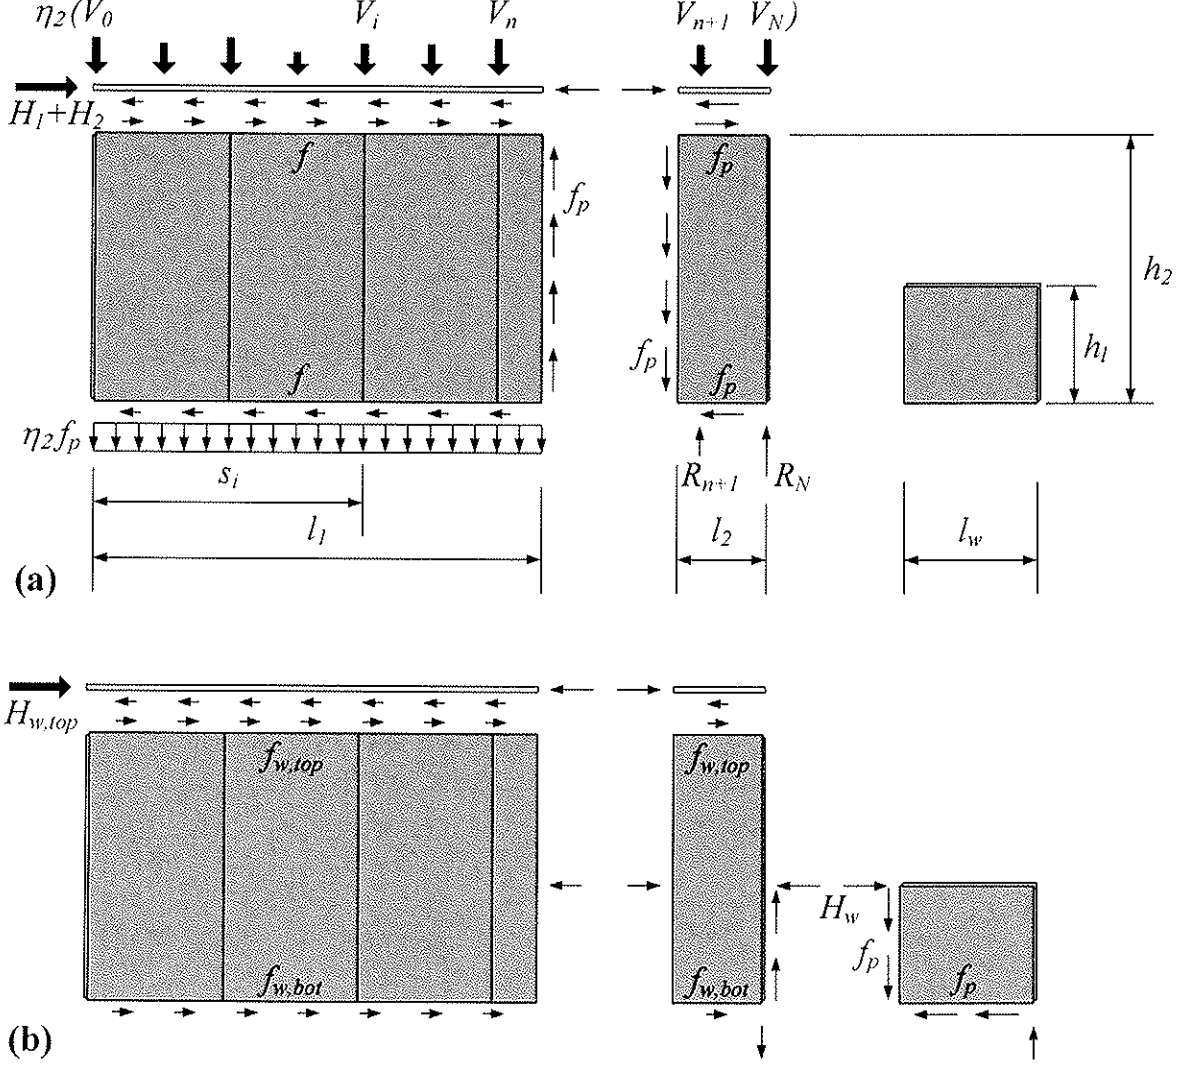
Assumed external and internal forces acting on the wall part left of the opening on the second storey. (a) Forces due to wall element 1 and 2. (b) Forces due to wall element below window opening.
